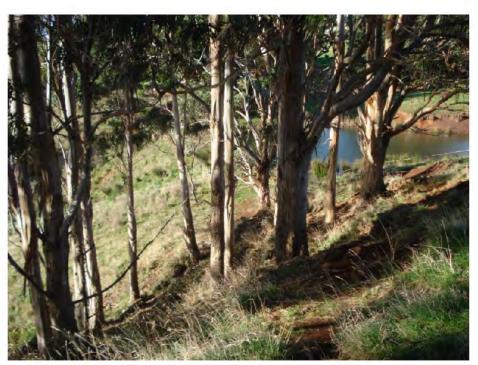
View of trees growing on head scarp above Port Road at CH 680m
